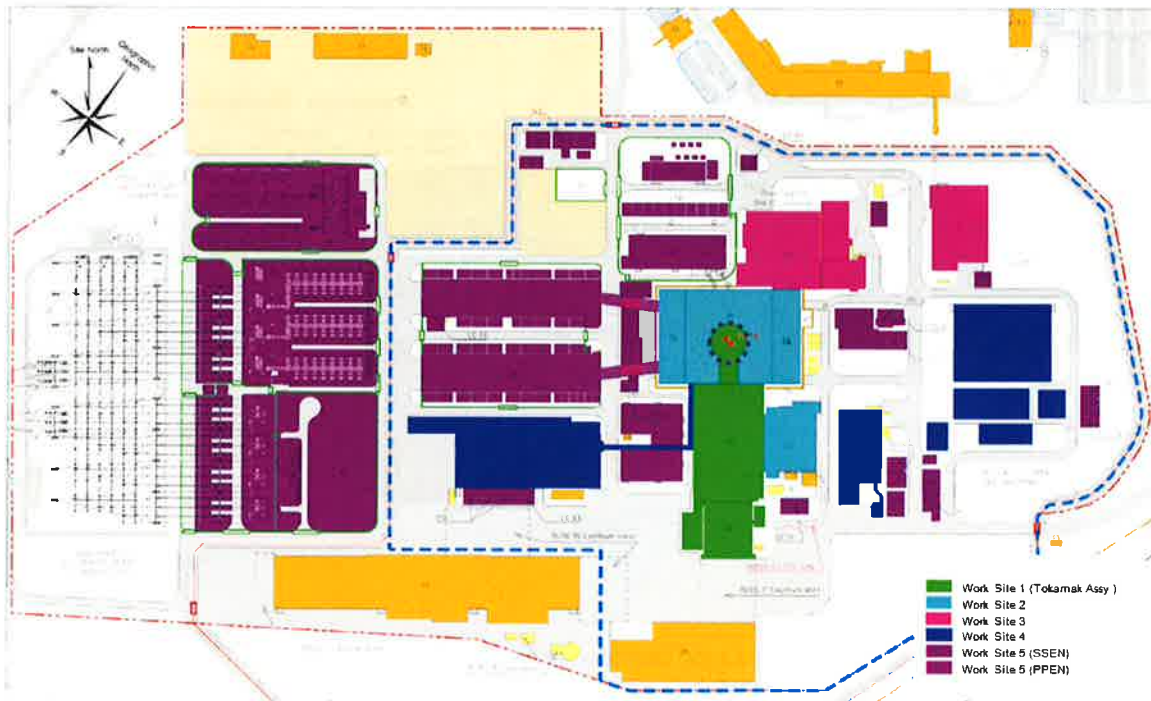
Breakdown of the ITER Site and buildings to independent Construction Worksites
